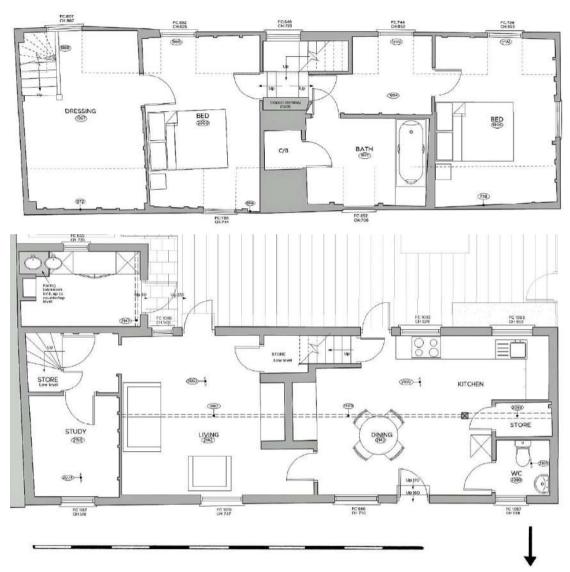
Current ground (bottom) and first-floor plans by Wincer Kievenaar. Scale in metres.
